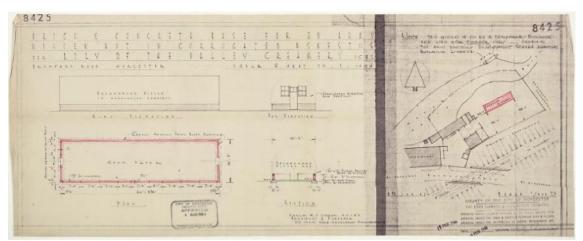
Building K 1942 planning application drawing (Building application number 8425)
